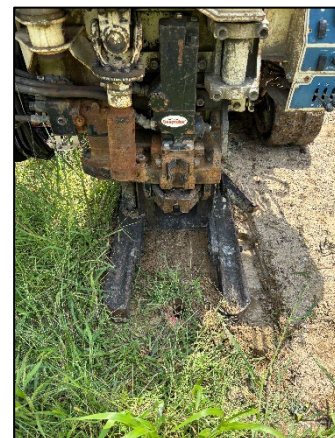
Viewing 11118 SB03 Drilling, Facing East.
